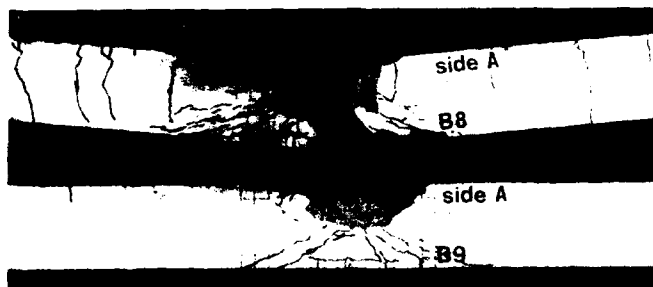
Explosive damage to 1:10 scale rectangular beams with 45° inclined charges.
